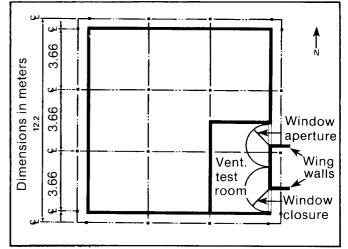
Plan View of FSEC Passive Cooling Laboratory (PCL) Showing Location of Test Room and Wing Walls
